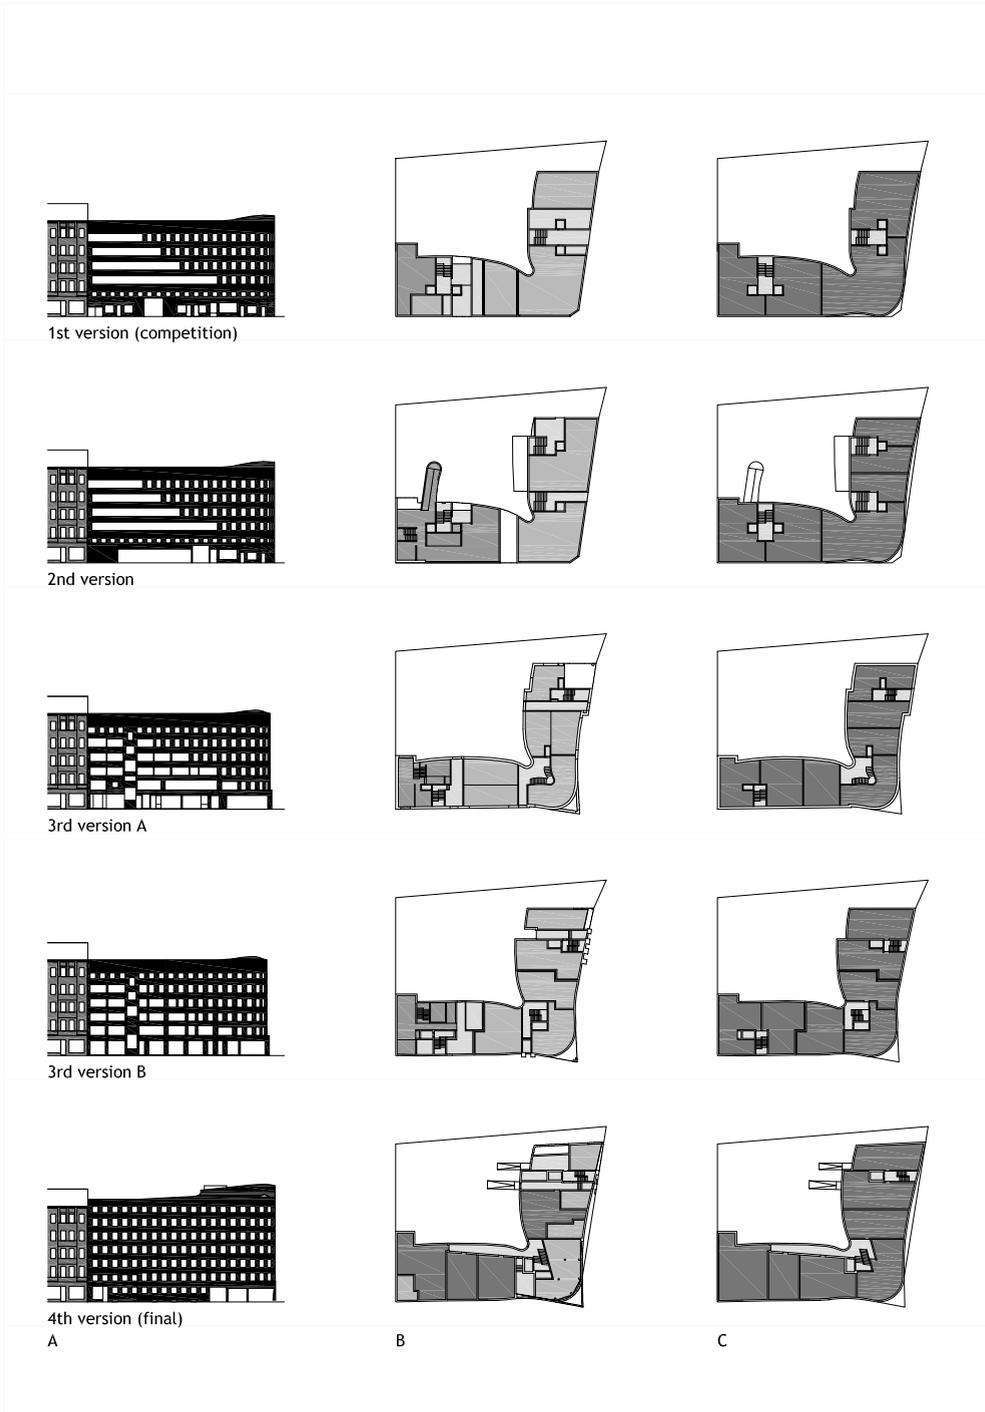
Álvaro Siza - Housing block in Schelesisches Straße, 1980-84; A - Elevation Falckenstein Straße; B - Ground Floor Plan; C - Typical Floor Plan. Source: author's drawing.
